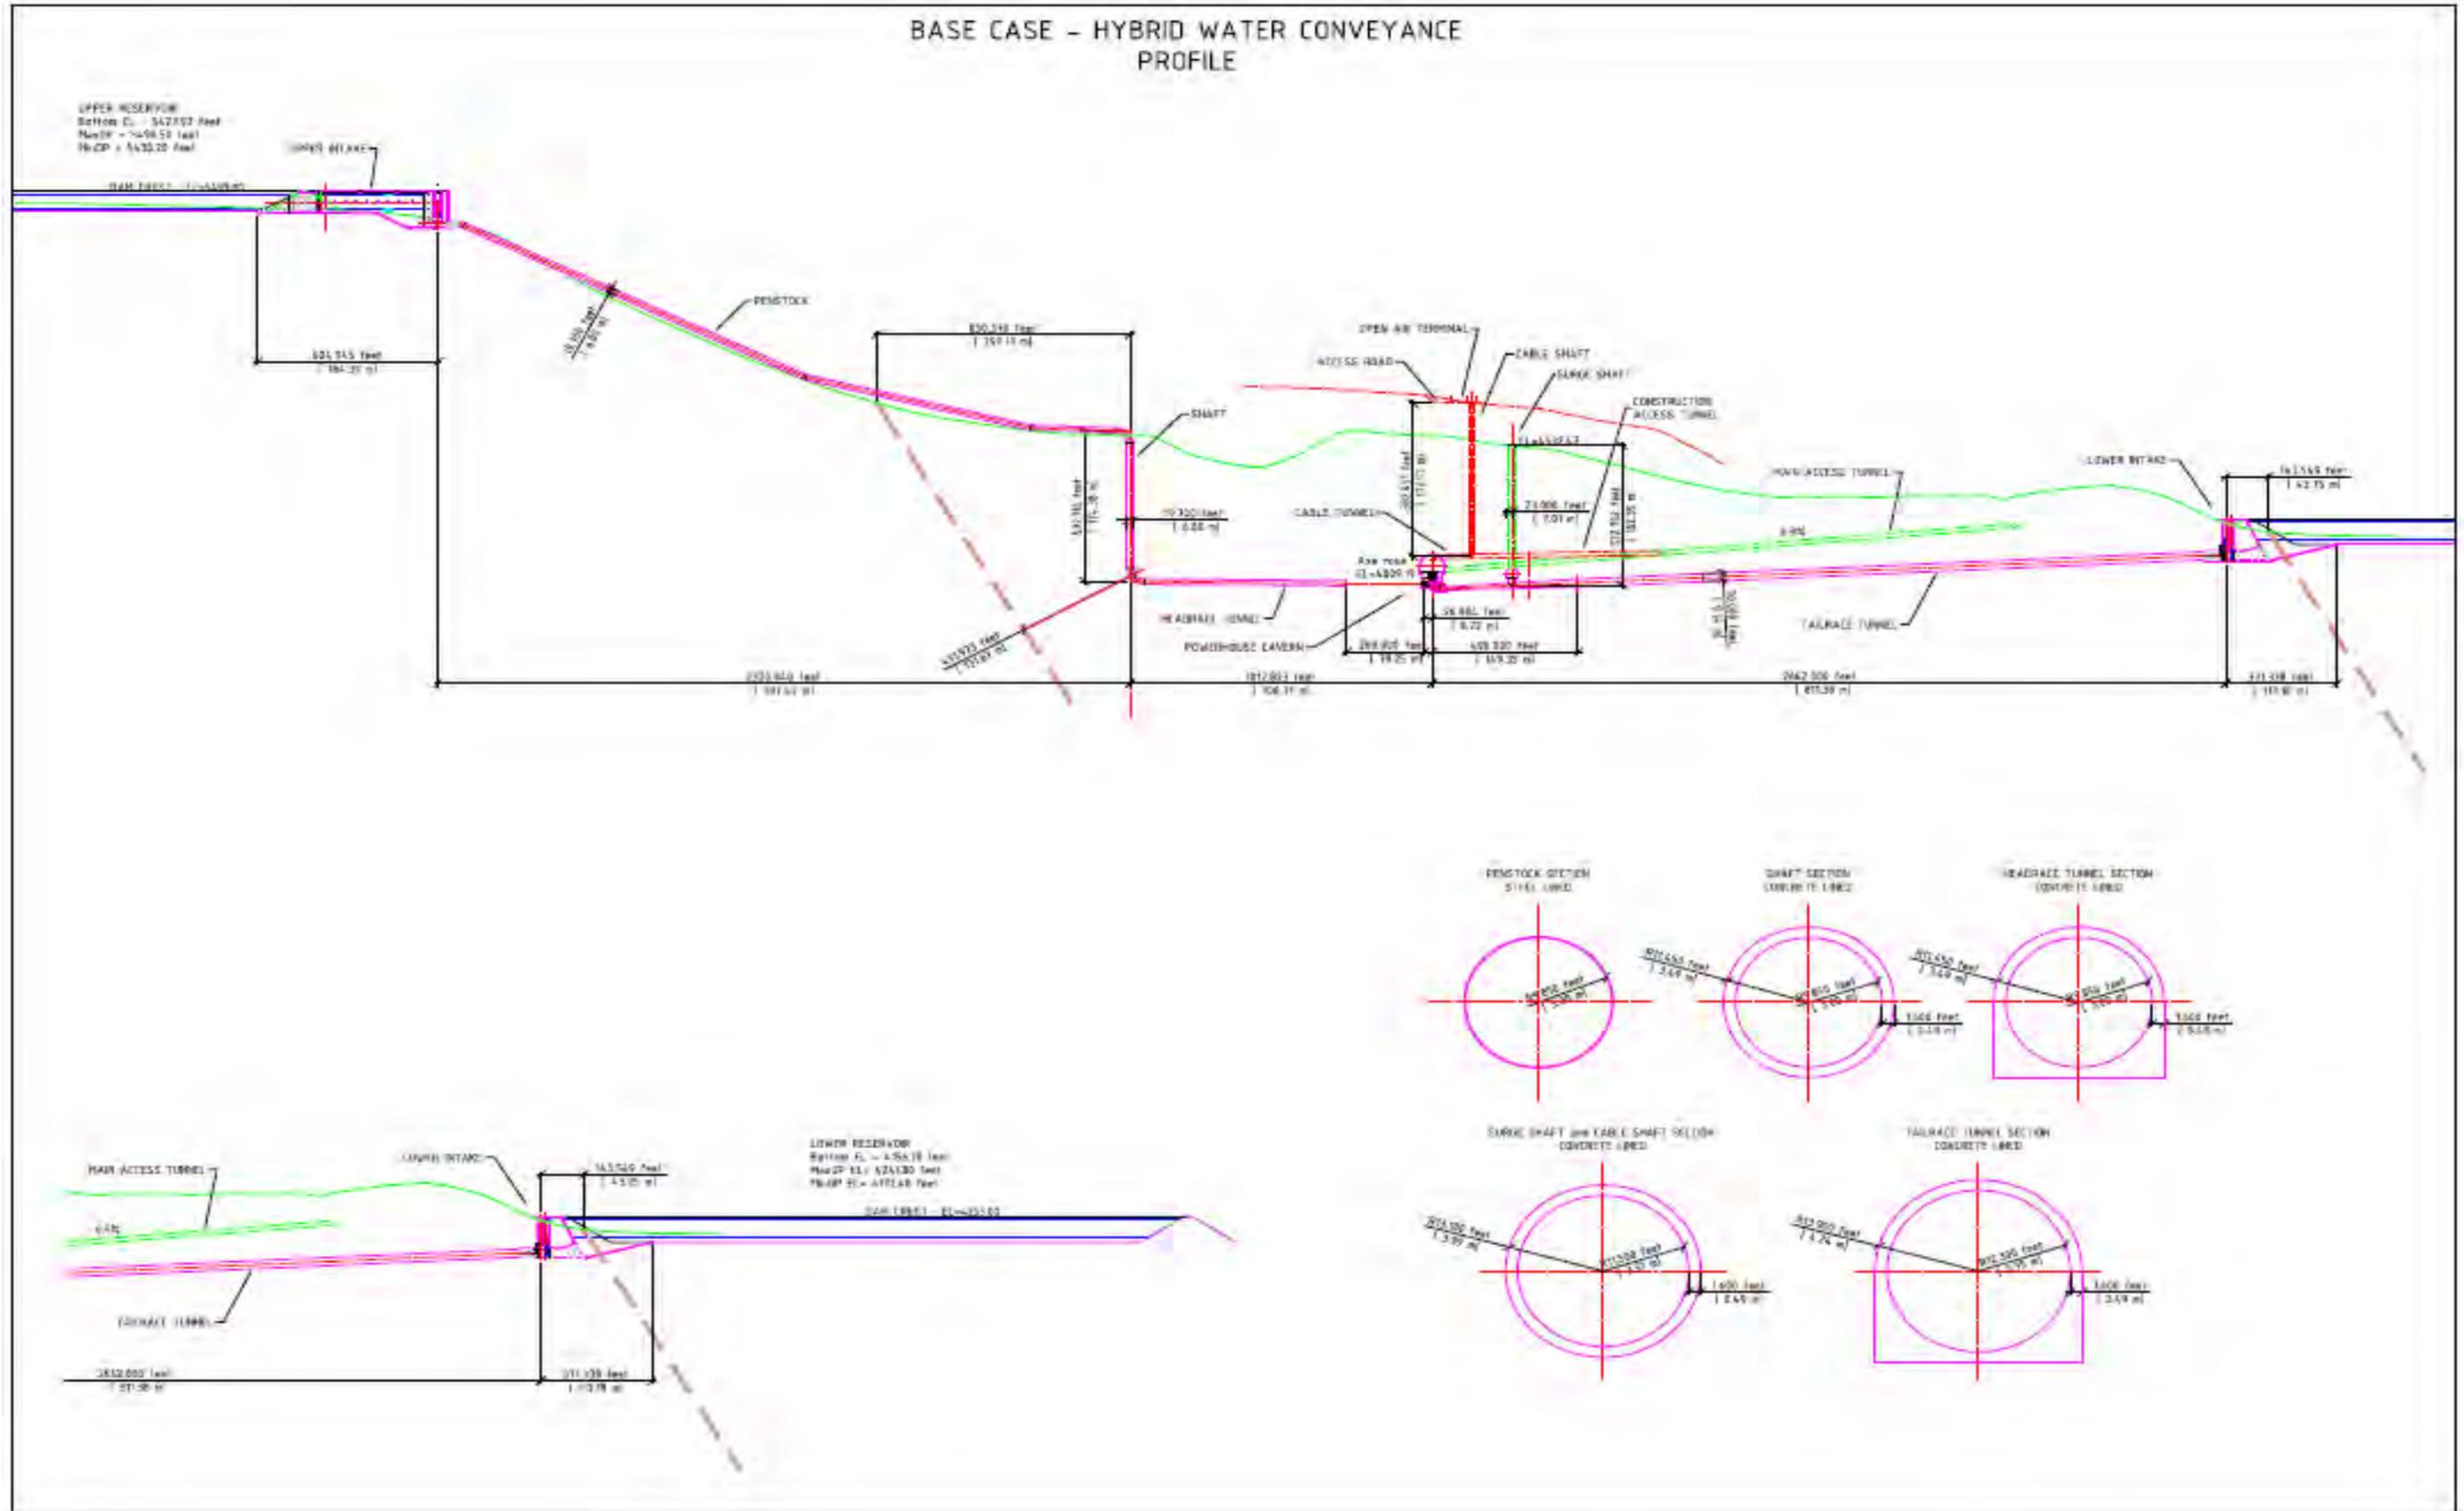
Swan Lake North Site Layout and Profile (Swan Lake North Pre-Application Document)
